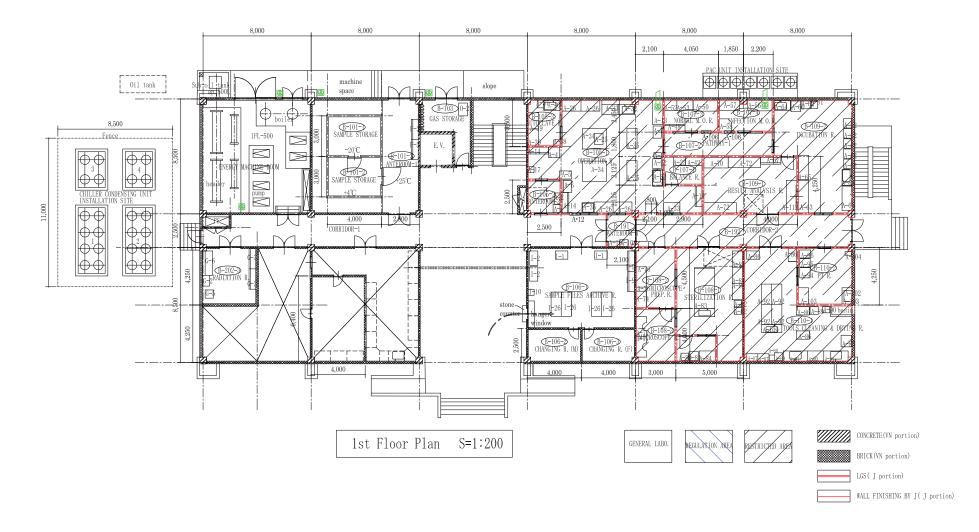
RETAQ center Reference Test Building: 1* Floor plan
